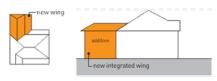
C.1-1: Possible forms for rear additions to single storey buildings.
